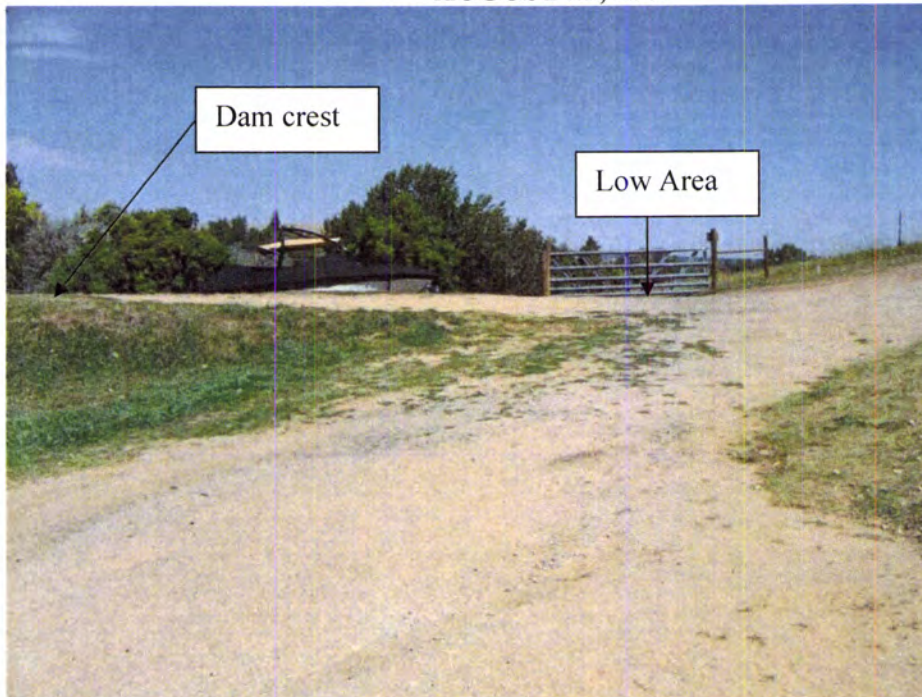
View of right abutment, looking downstream. Note the low area in the right abutment.
